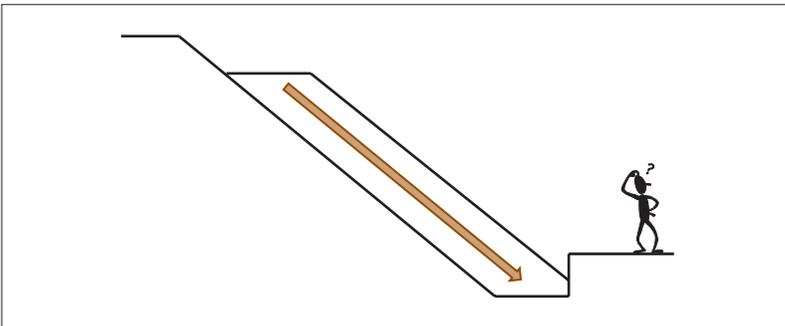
Overall instability, slope stability into a newly excavated trench – strength controlled ULS (GEO)
